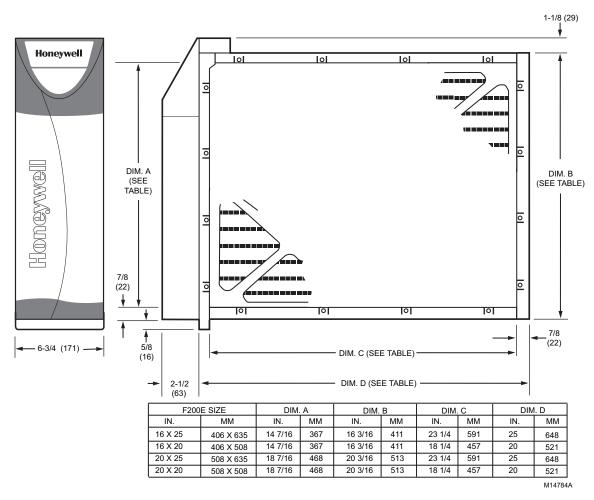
Installation dimensions in in. (mm) of air cleaner.
